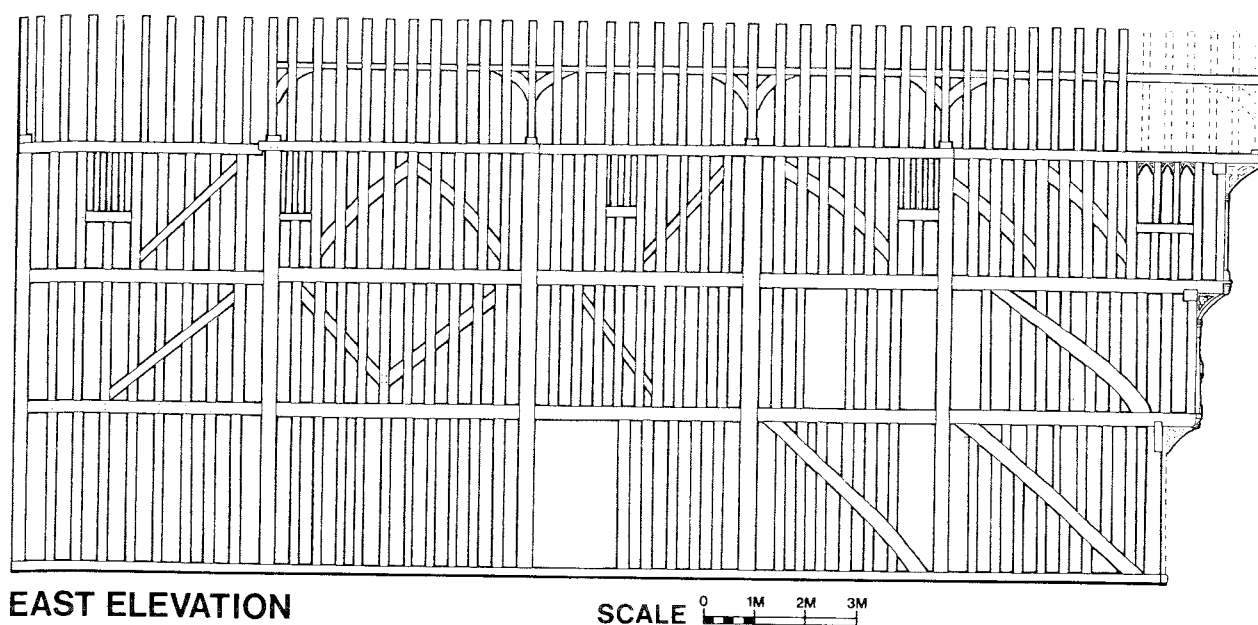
The Red Lion, Colchester. East elevation of the timber frame.
